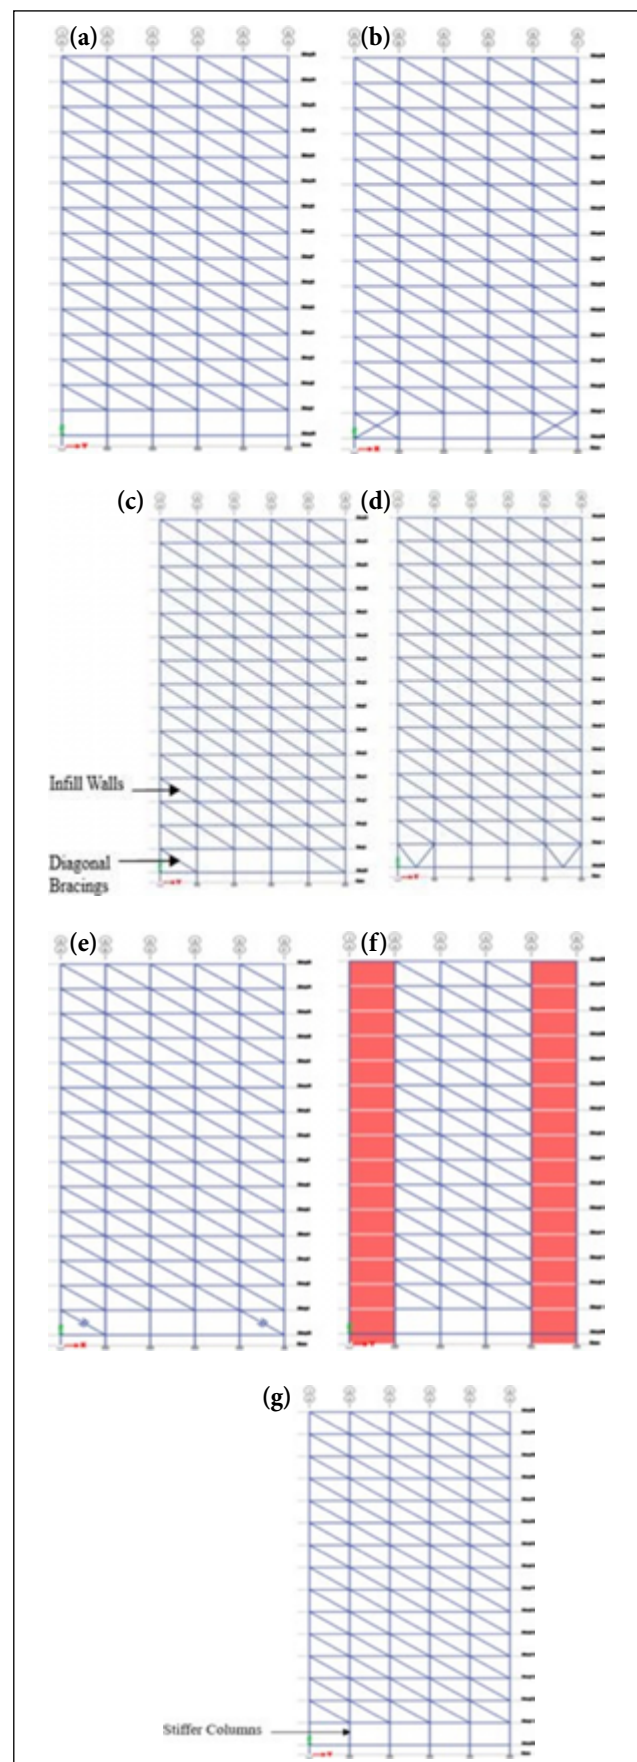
(a) Building with ground open storey, Soft storey building with (b) cross bracings, (c) diagonal bracings, (d) V bracings, (e) viscous damper, (f) shear wall, (g) stiffer columns.
